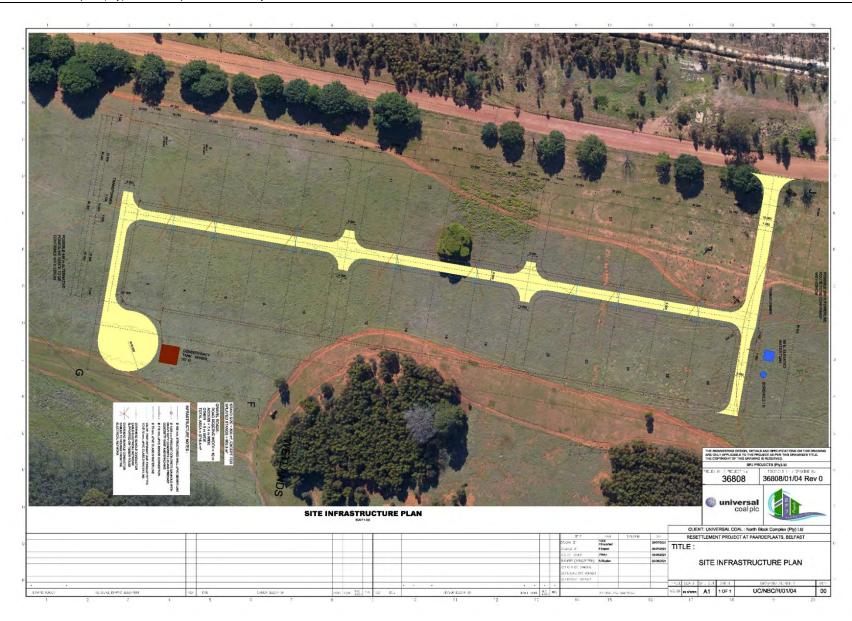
Proposed North Block Complex (Pty) Ltd Paardeplaats Community Residential Area Layout
